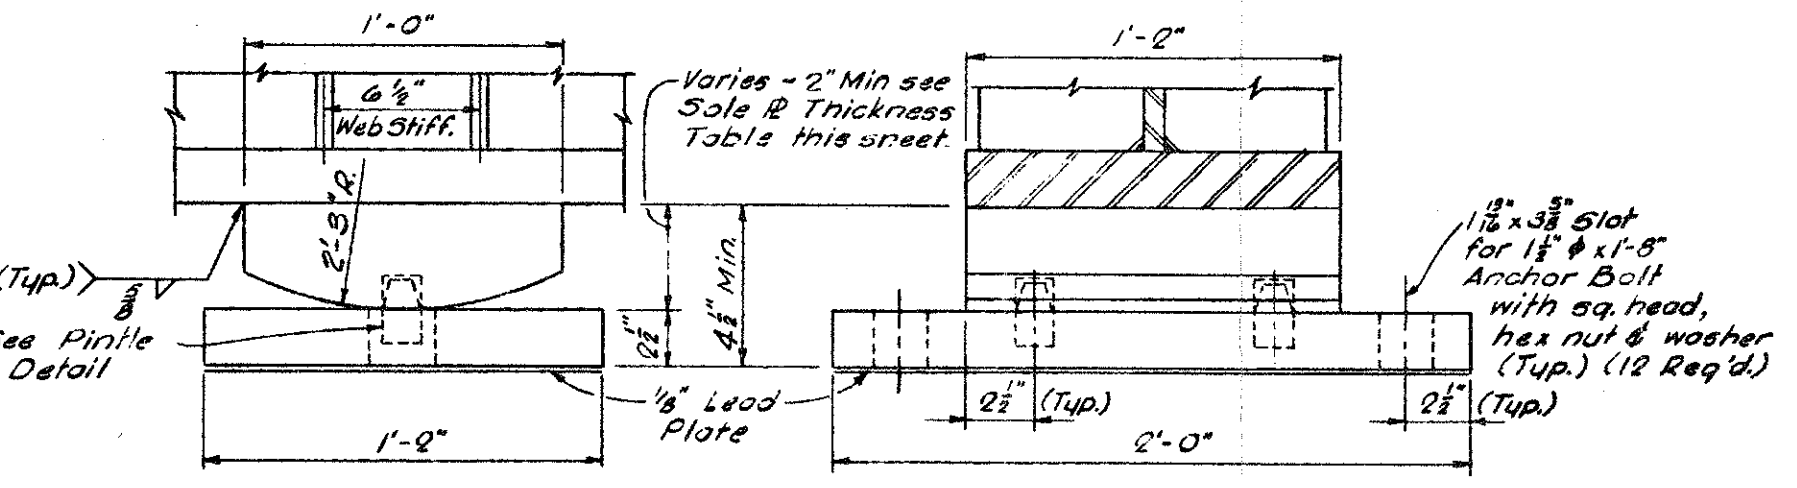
DETAIL OF ABUTMENT BEARING PLATE SHOWING CLIP
